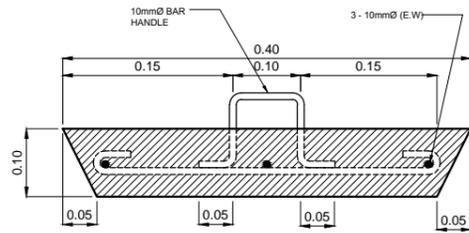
DETAIL "B" TYPICAL COVERED WALK SECTION DETAILS
